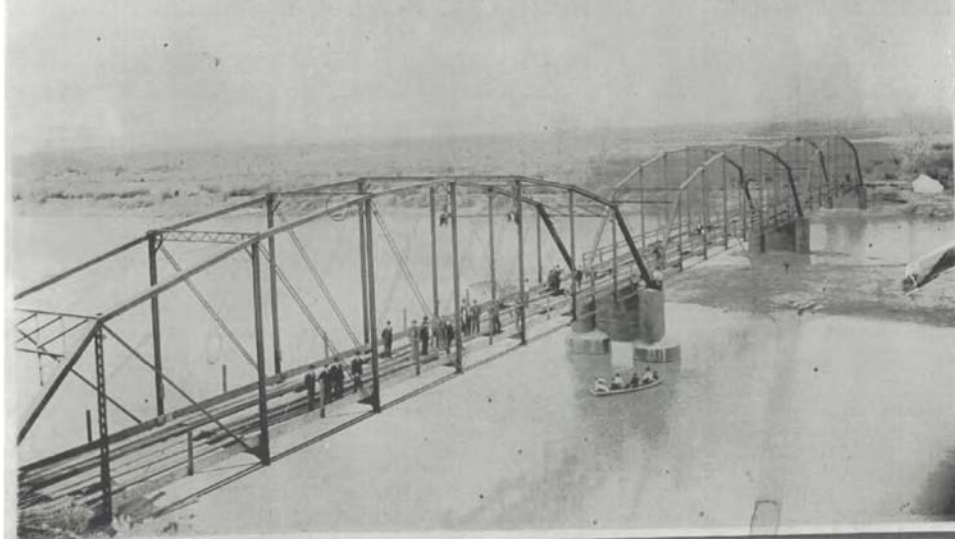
Photo of Fruita Bridge believed to be from spring of 1907, when the bridge was under construction. Most of the timber stringers have been set on the floor beams, but are laying flat, with people are standing on them. The stringers on the exterior sides are oriented vertically and the wood posts for the railing have been installed. (Photo courtesy of Museum of Western Colorado).
